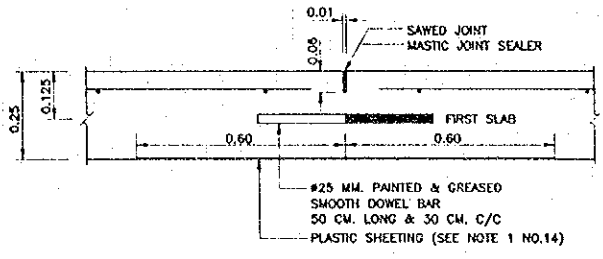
DETAIL OF BROOM SURFACE CONCRETE PAVEMENT SCALE 1:10
